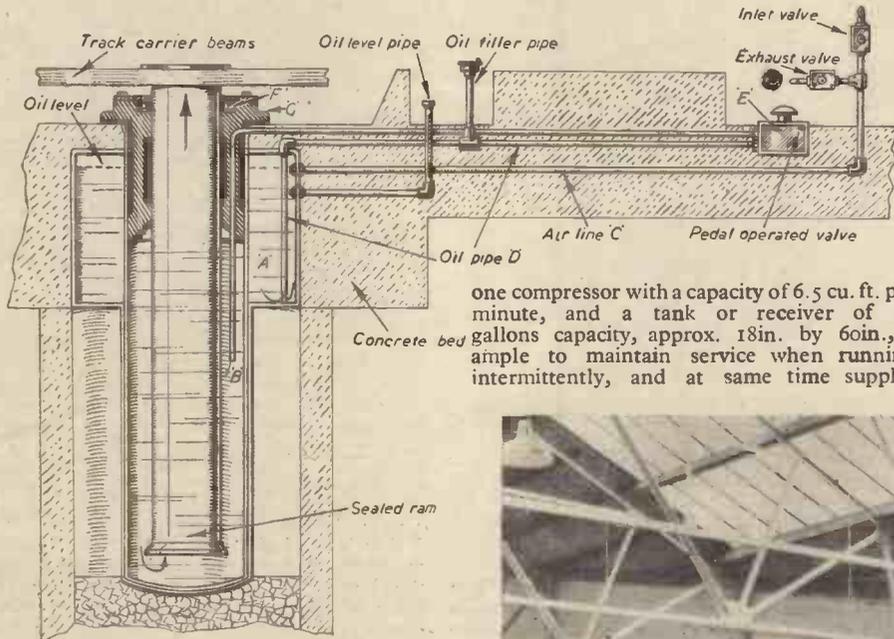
Sectional view of a solid or sealed ram type of lift. Oil level, oil filler, inlet and control valves may be at any convenient distance from the unit.
